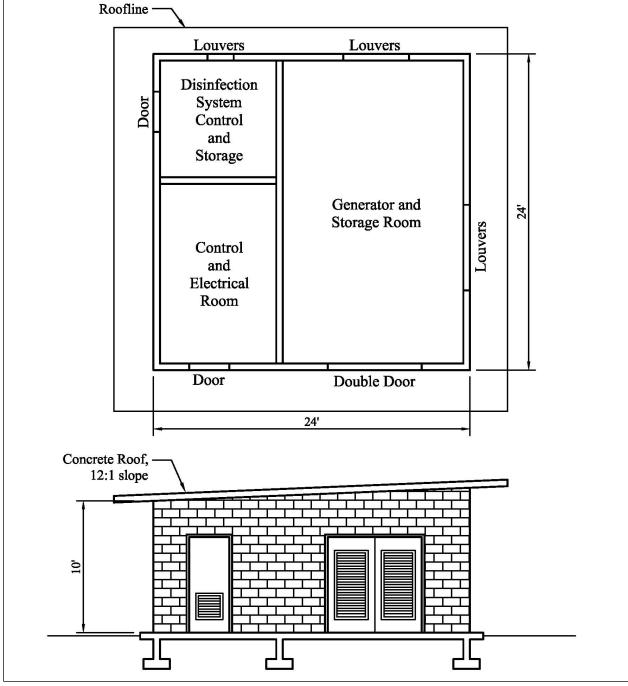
Conceptual Plan View of Pump Control and Chlorination Building
